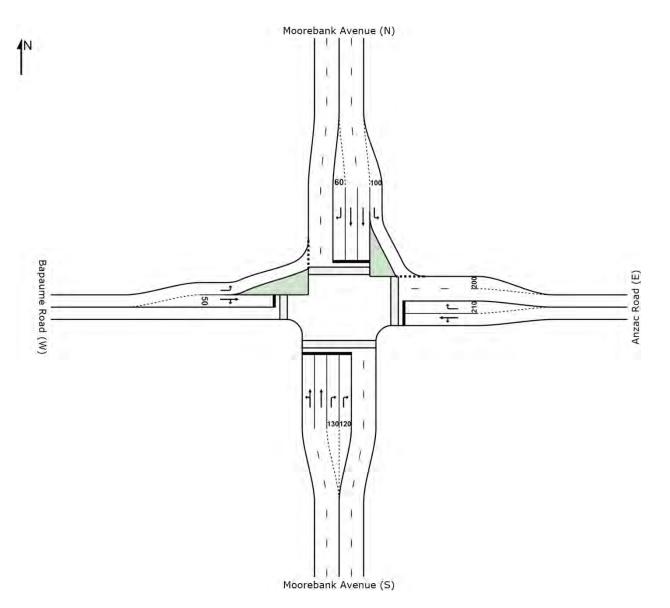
Modified intersection of Moorebank Avenue, Anzac Road and Bapaume Road for cumulative scenario 3
